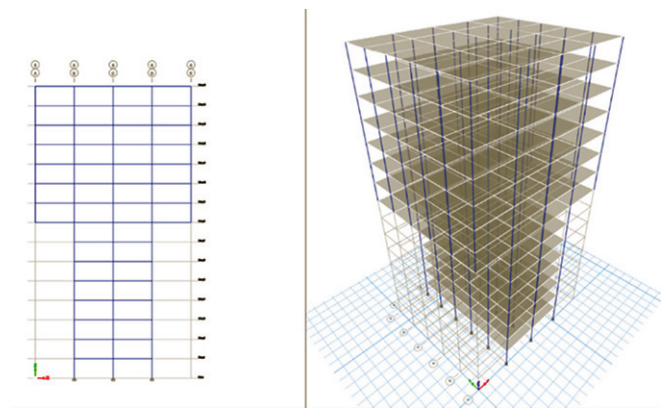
Views of the Vertical Geometric Irregular-3 Model in elevation and 3D for both composite and RC buildings
